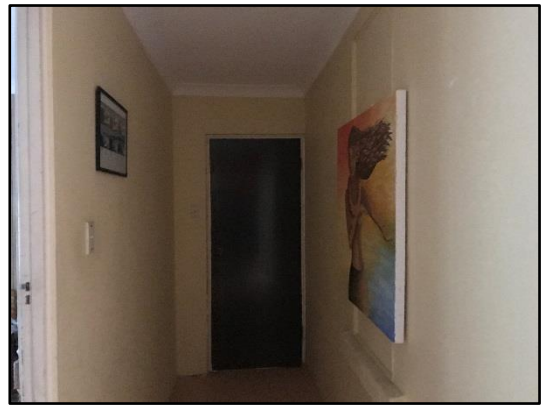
View of internal hallway to rear of site. Note infilled early rear window.
